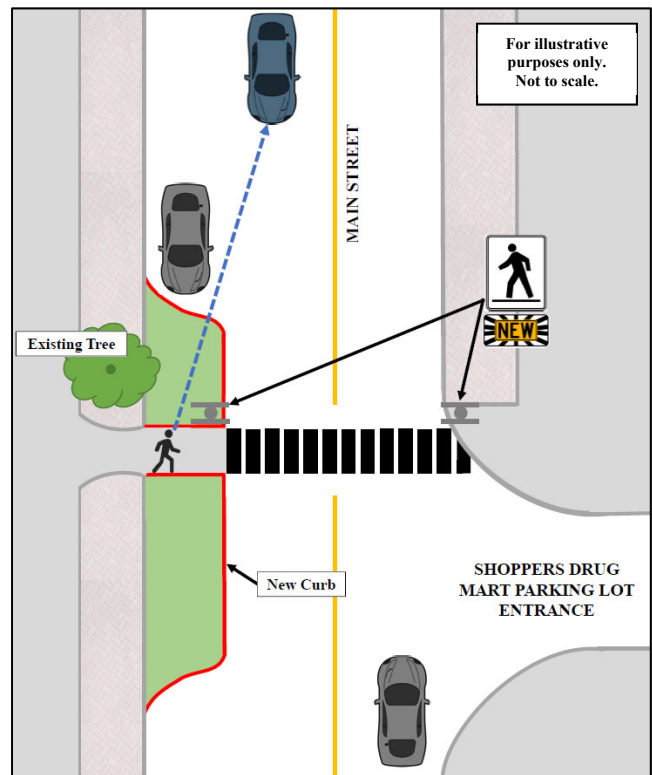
Sketch of Proposed Crosswalk & Curb Extension
